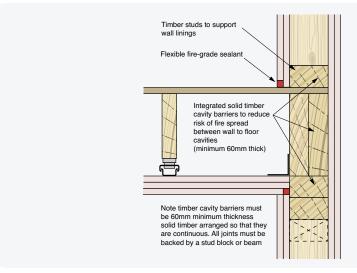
FRL 120/120/120 Fire-protected single stud timber frame wall/floor junction with integral cavity barriers – beams parallel to wall.
